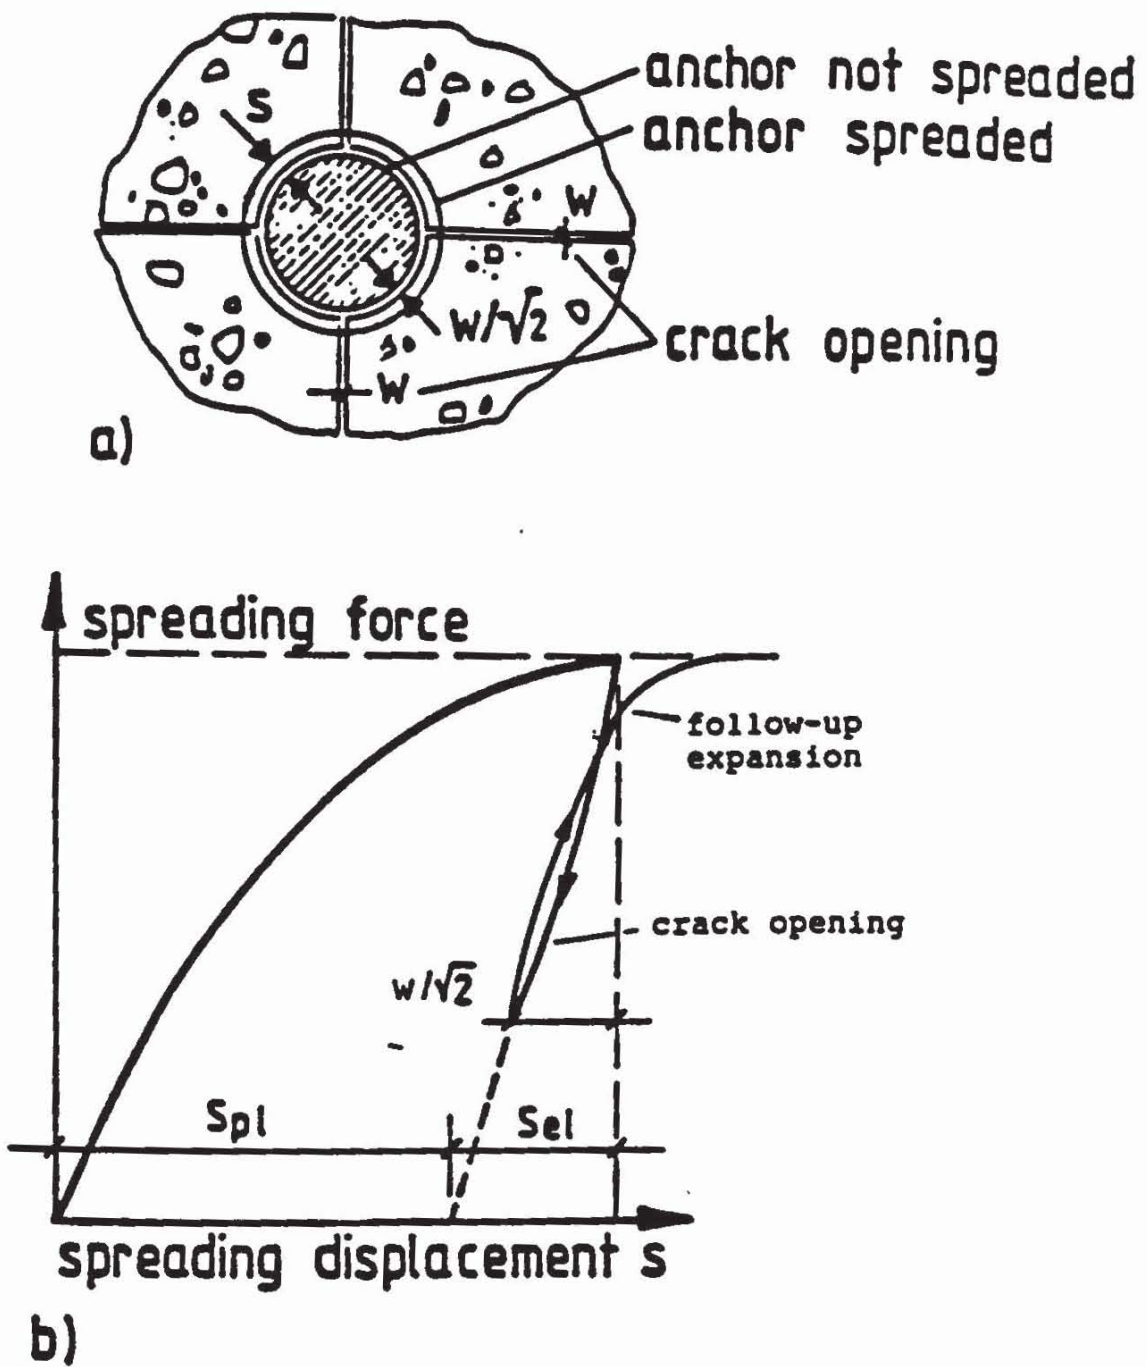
Influence of crack opening on the spreading force of expansion anchors (after /4/)
